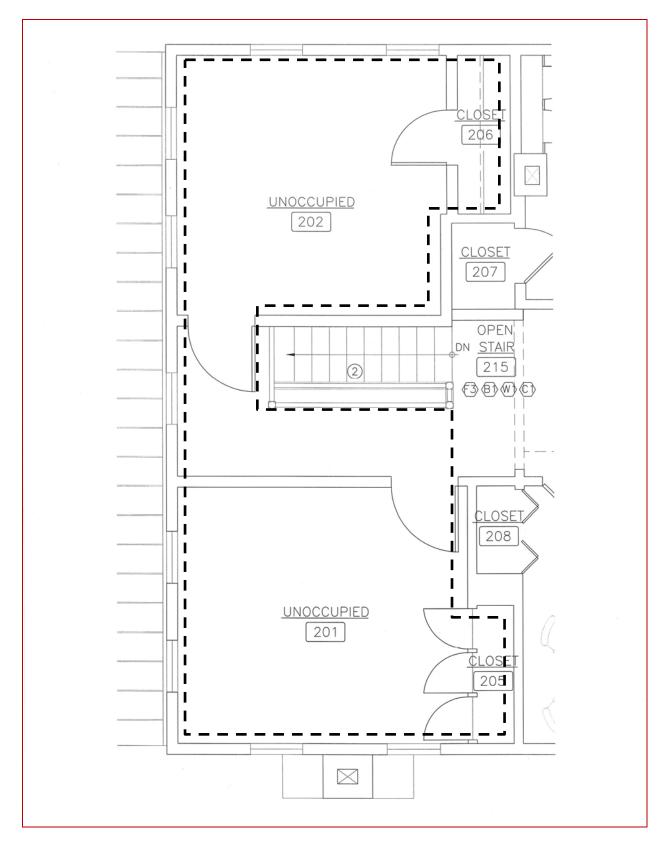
Second Floor Joists Below Front Bedrooms Are Inadequate
